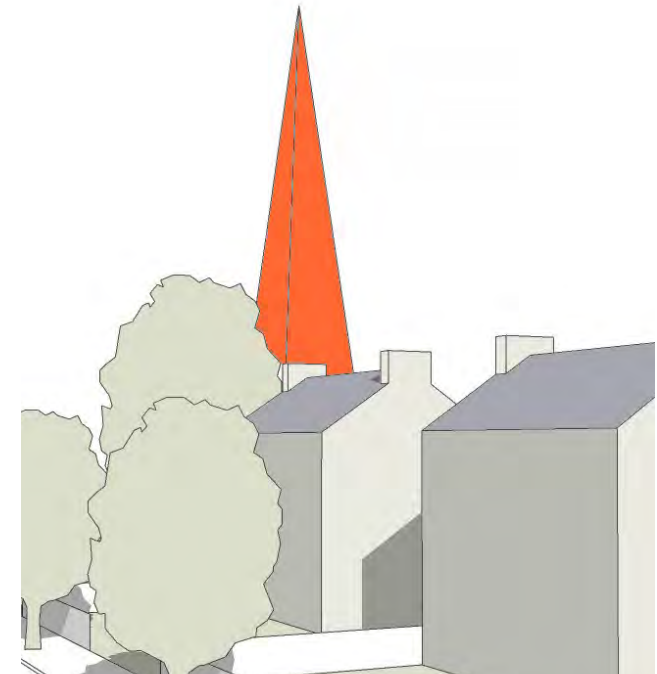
New developments should respect the existing shape and rhythm of skylines and designers should make sure that new buildings do not obstruct views to local landmarks such as Church Spires
